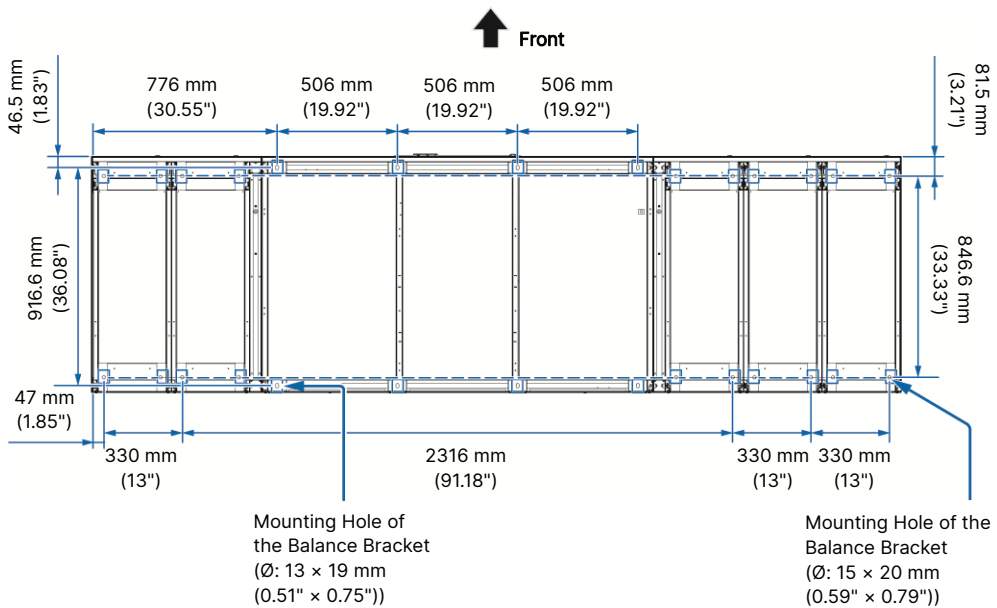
1250kVA UPS_ Cabinet Floor Fixing Points
